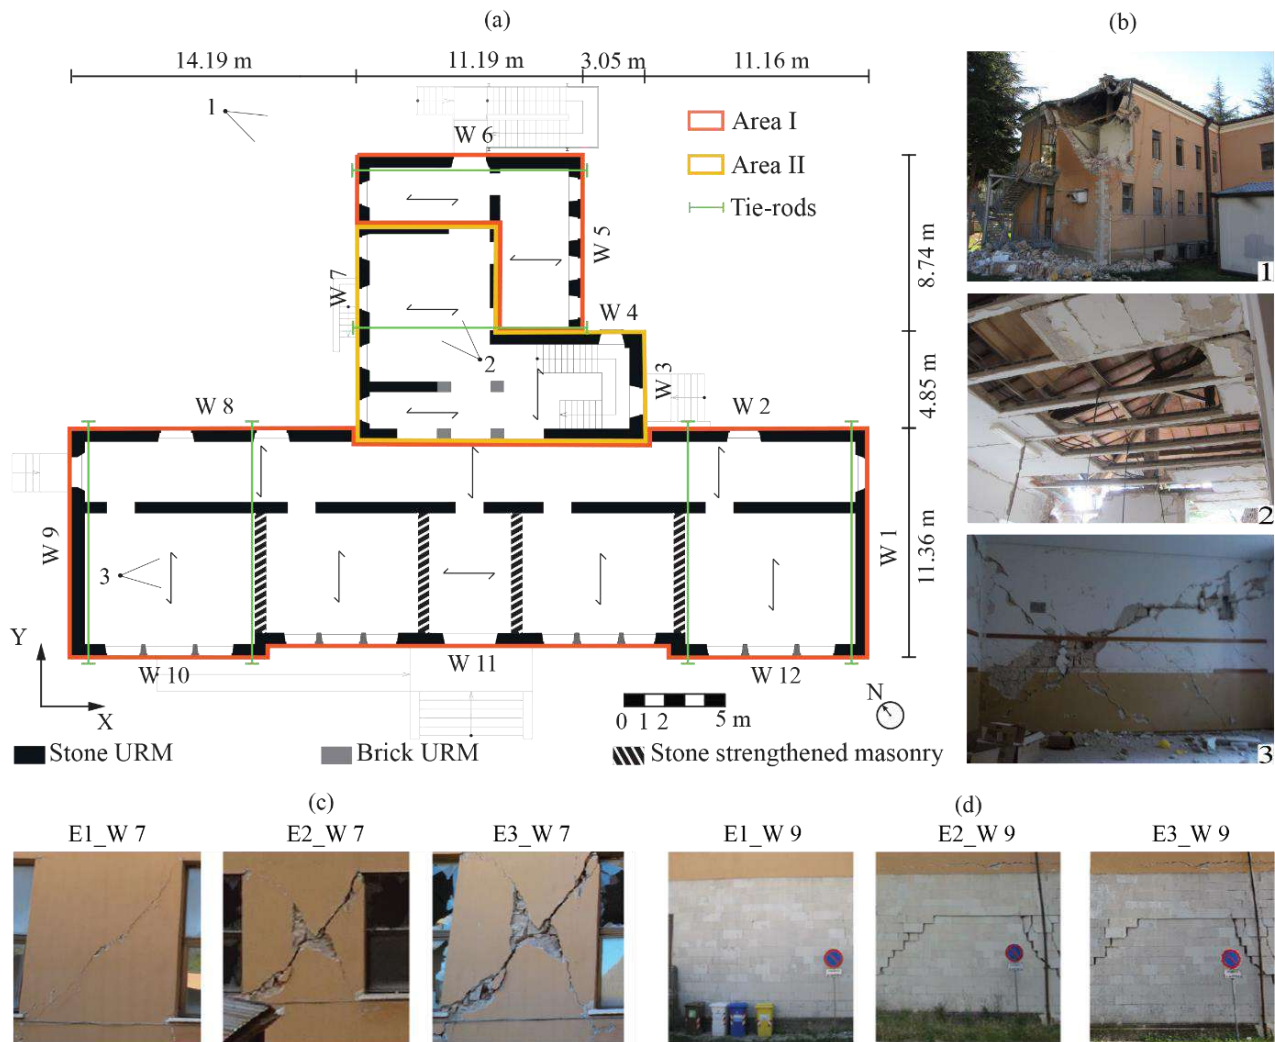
(a) Plan view of the building; (b) damage to different structural components (walls and diaphragms) observed after event E3; (c) cumulative damage observed on a pier of load-bearing wall W7; (d) cumulative damage observed on a pier of load-bearing wall W9.
